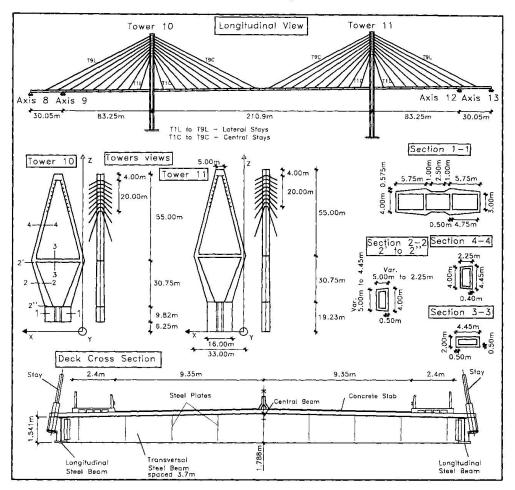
General geometry of the Pereira-Dosquebradas bridge
